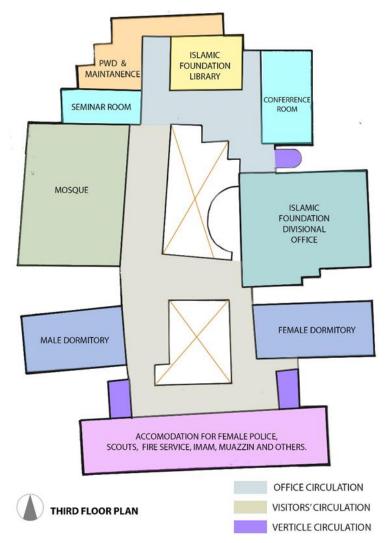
(left) Zoning of Third Floor Plan. Source: Author.
